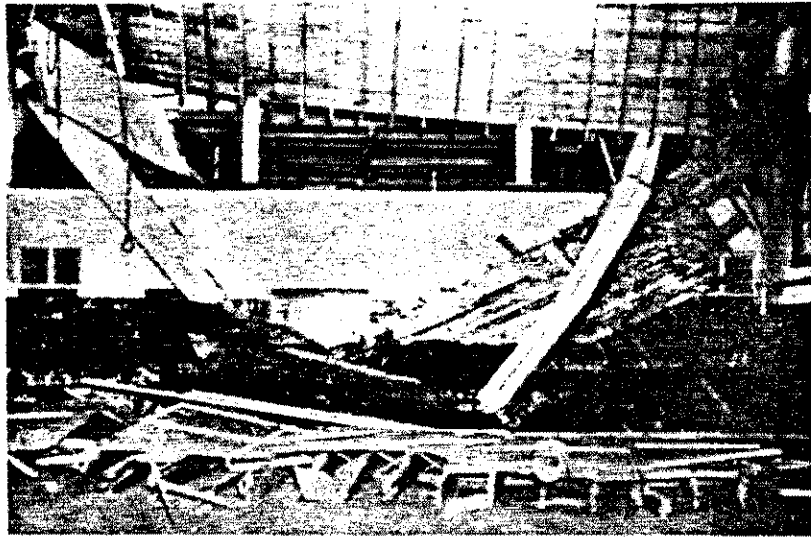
Damage at the Collegiate and Vocational School, Cornwall (Cornwall Daily Standard-Freeholder 1944).
